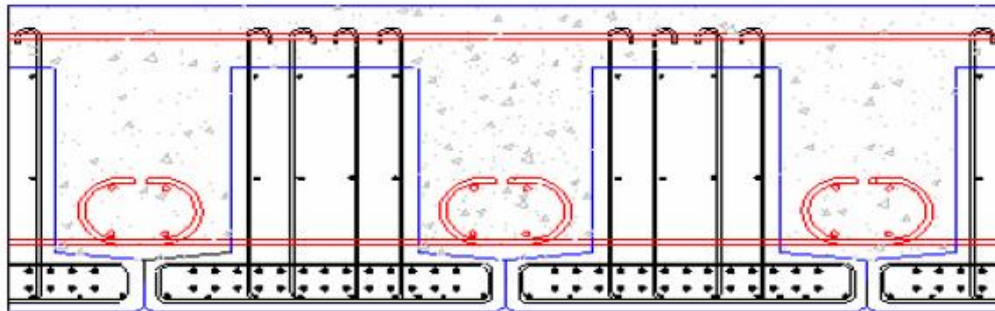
Cross section of Poutre Dalle System (Hagen, 2005)
